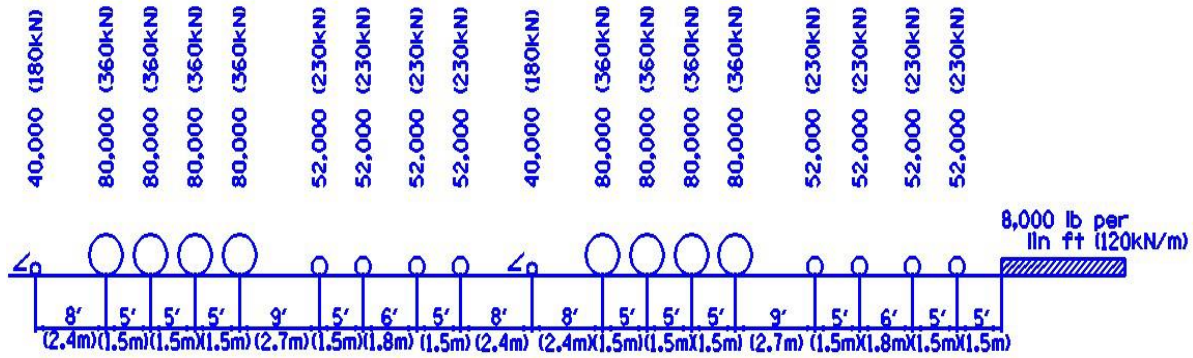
Live Load arrangement of Cooper EM 360 Loading
